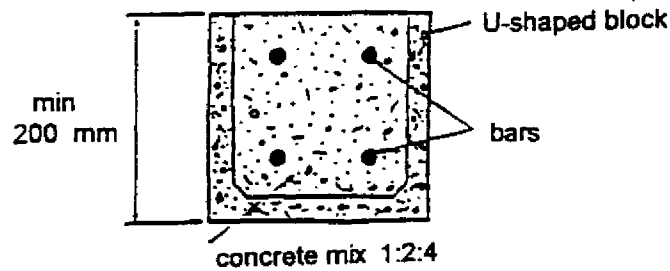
Reinforcement in R.C. Band [1,7]
